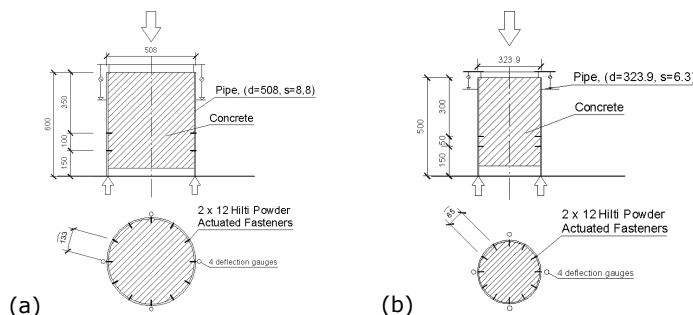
Push-out test setup: (a) Pipe 508/8.8, and (b) Pipe 323.9/6.3 [73]
